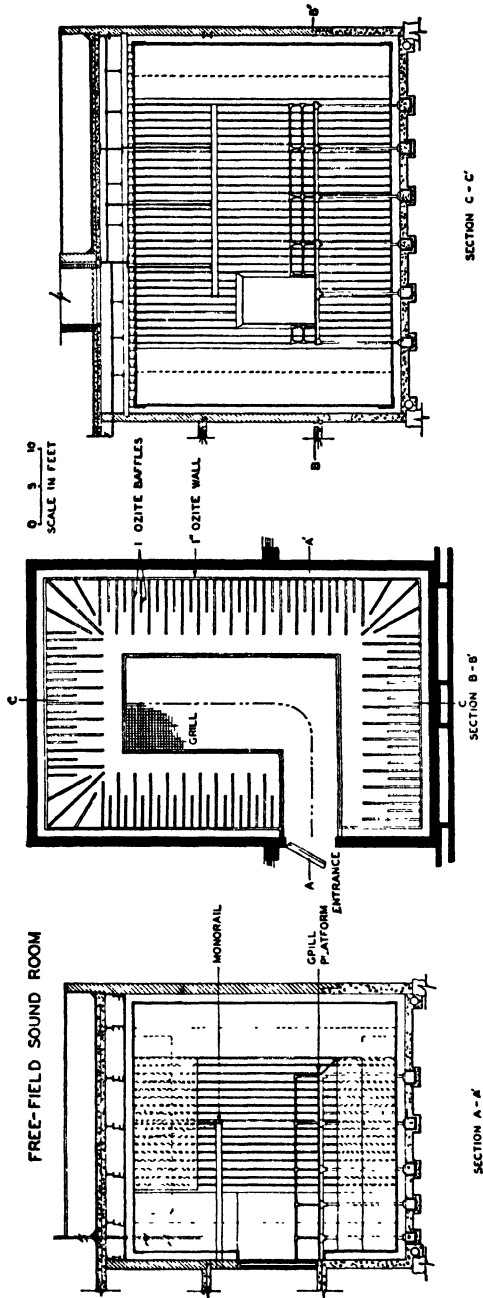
End elevation, plan and side elevation of a free-field sound room.
